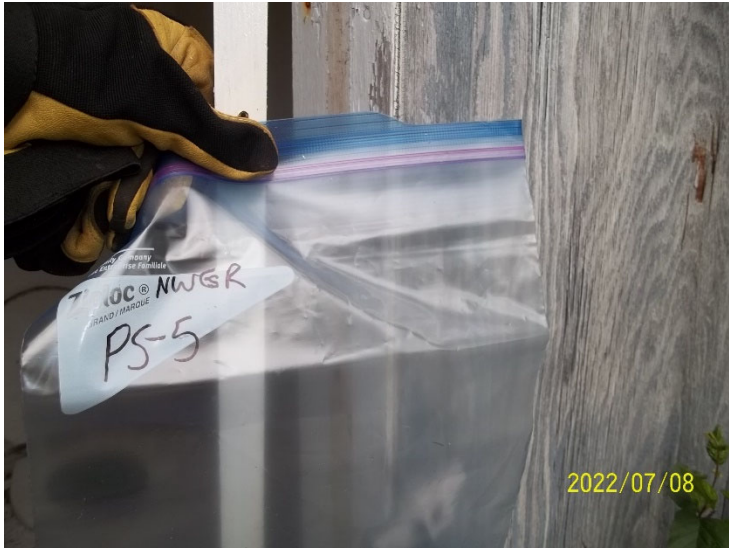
View of paint sample NWGR PS-5, wall, outhouse exterior.
